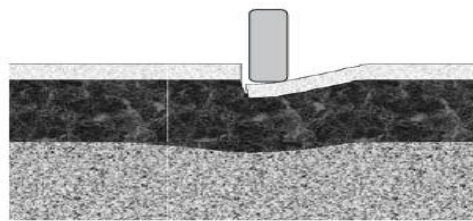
Longitudinal joint faulting mechanism in ALF UTW slabs.
